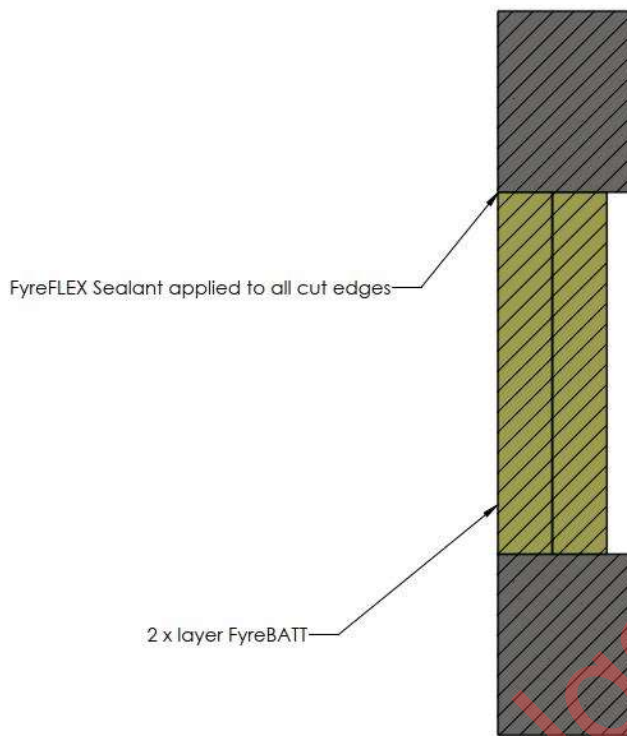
Blank seal protected with two layers of FyreBATT in concrete / masonry wall – applied back-to-back
